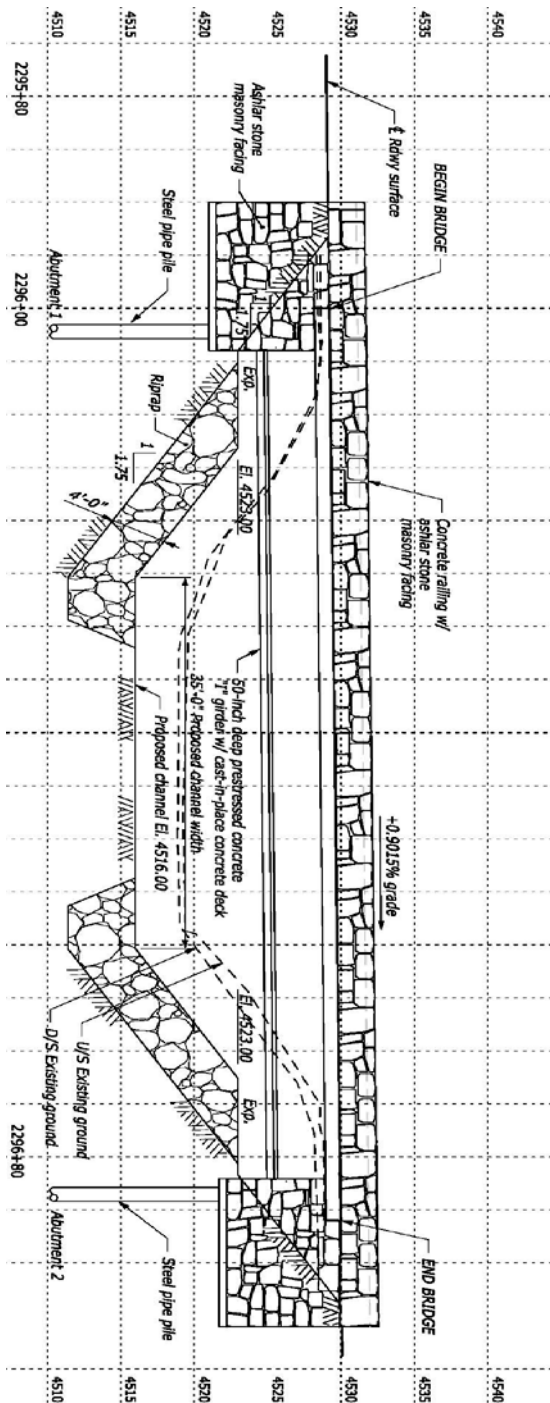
Preliminary design layout for the new Rose Creek Bridge; typical bridge section depicting elevations.
